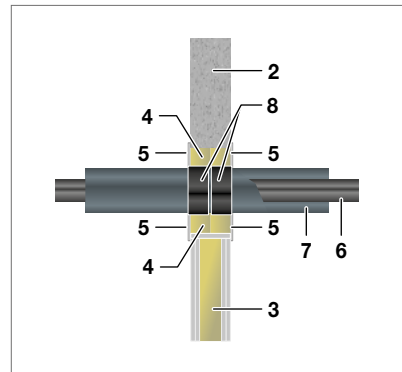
Soft firestop in the solid wall and light-weight partition with Viega piping system plastic
